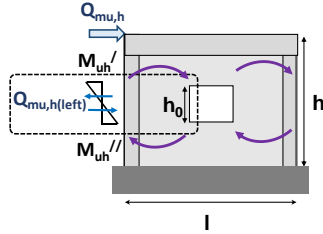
Flexural strength of wall with opening considering moment about horizontal direction
